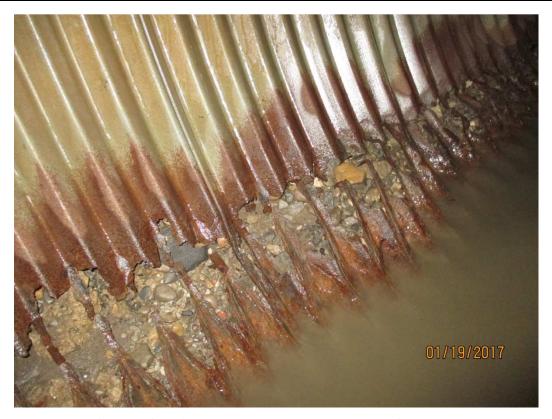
Corrosion with Critical Perforations & Section Loss – West Side of Section 4 of East Culvert Pipe
